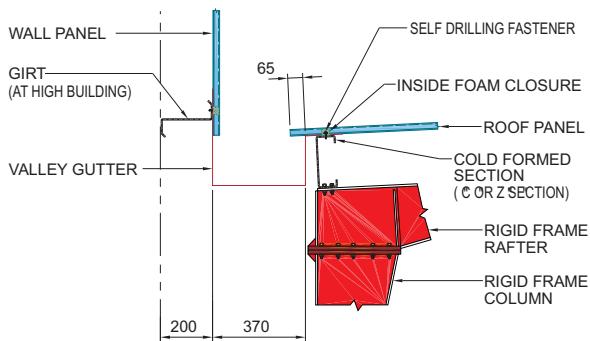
DETAIL-L : VALLEY GUTTER DETAIL AT MULTI-GABLE OF BLDGS. WITH COMMON EAVE HEIGHTS
